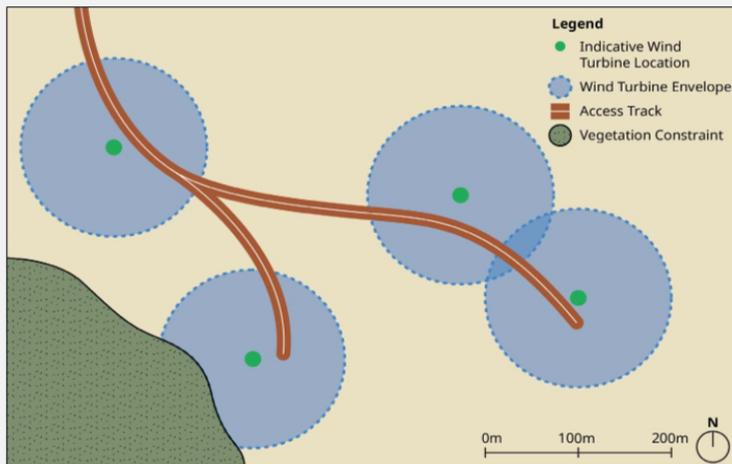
Example site plan showing wind turbine envelopes for micro-siting post-development approval
